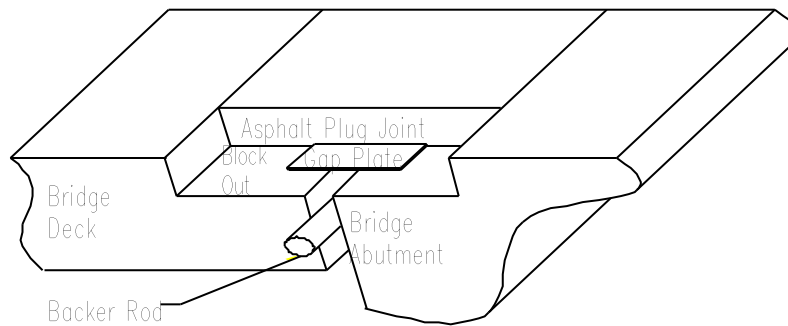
Typical Asphalt Plug Joint Cross Section.
